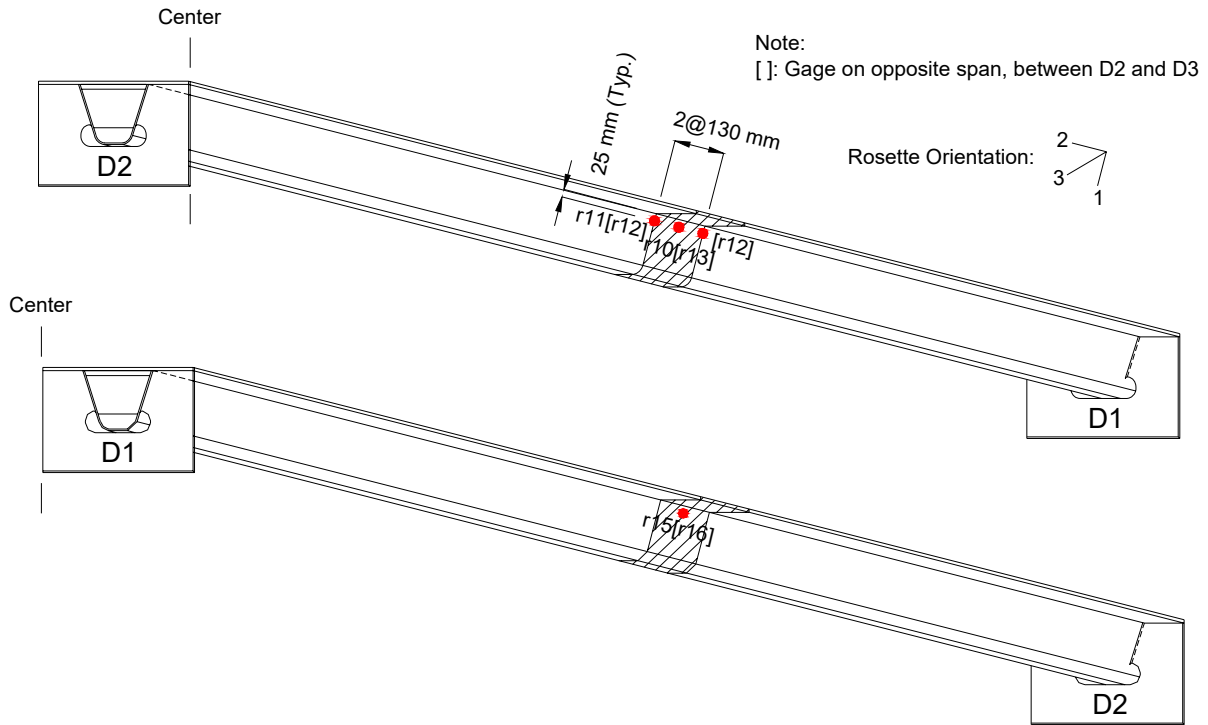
Specimen 3: Strain Gages in Outer Surface of Rib R3 near Rib-to-Deck Welds
